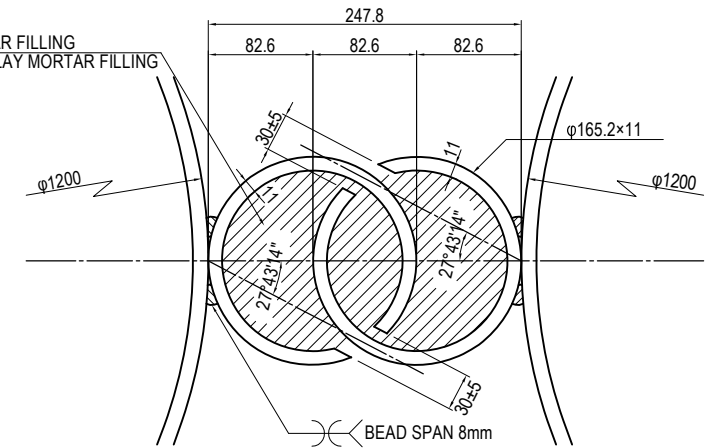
DETAIL OF PERIMETER FIELD WELDING OF STEEL PIPE SHEET PILE S=1:4
